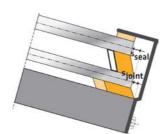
Forces, displacements and deformed joints after the flat bonded assembly is cold bent and mechanical devices are used
